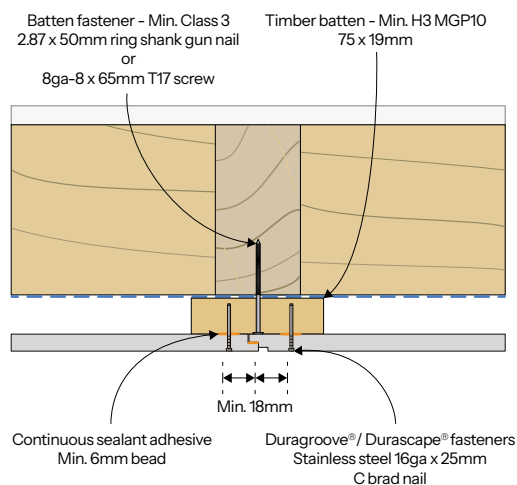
Timber frame - cavity fix (19mm) fastener detail Plan
